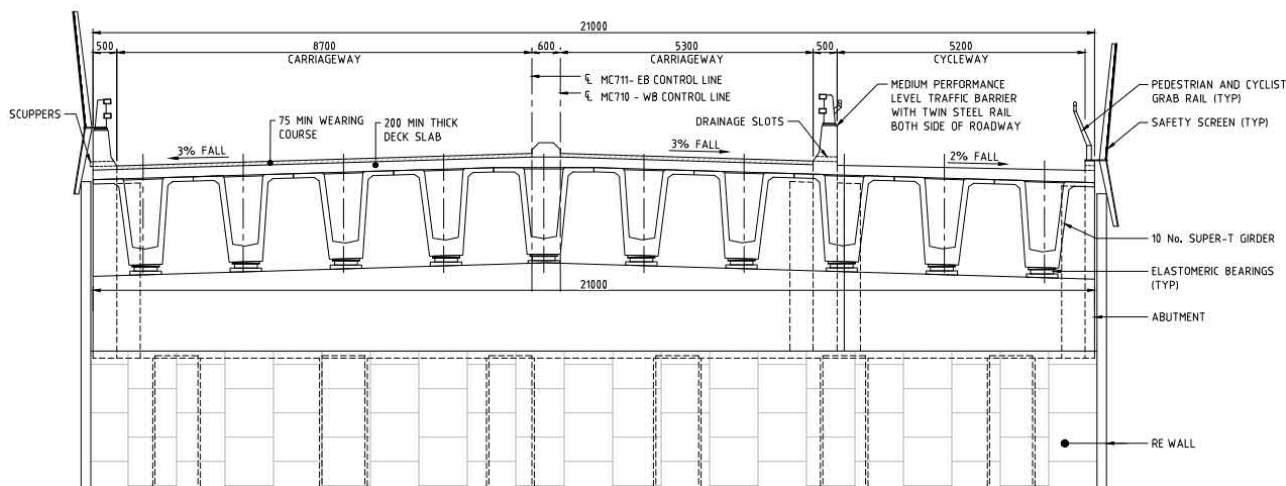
Typical cross section –Bridge over Tuggeranong Parkway
